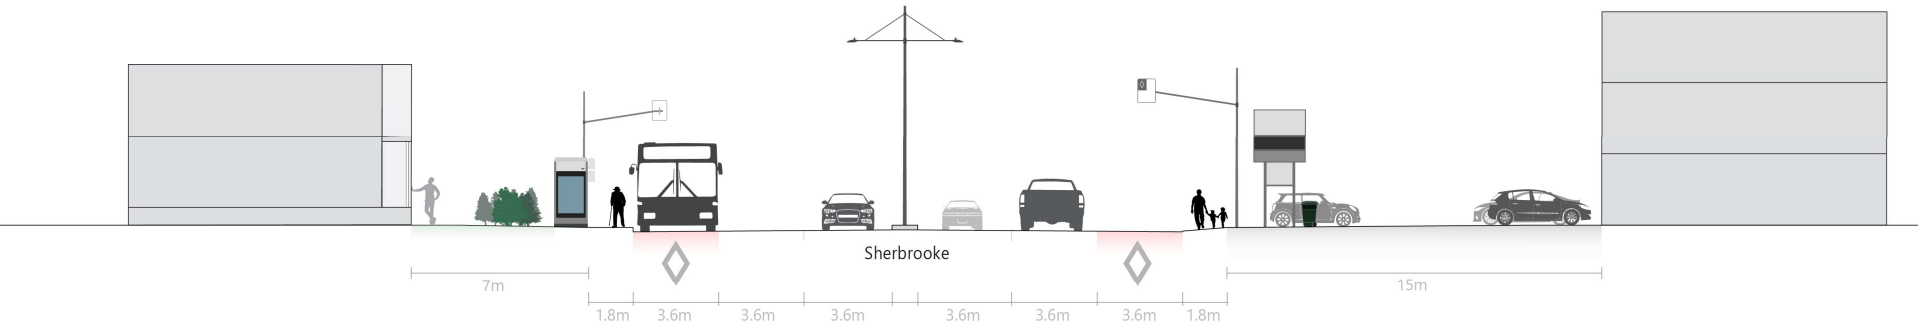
Cross section of Sherbrooke street (Authors, 2023)
